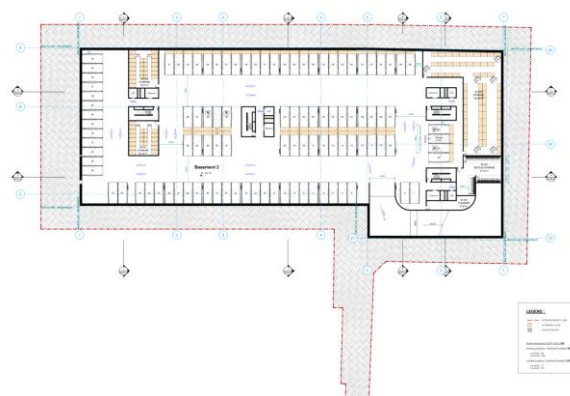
Revised Basement 2 (Source: PMDL Architects)
